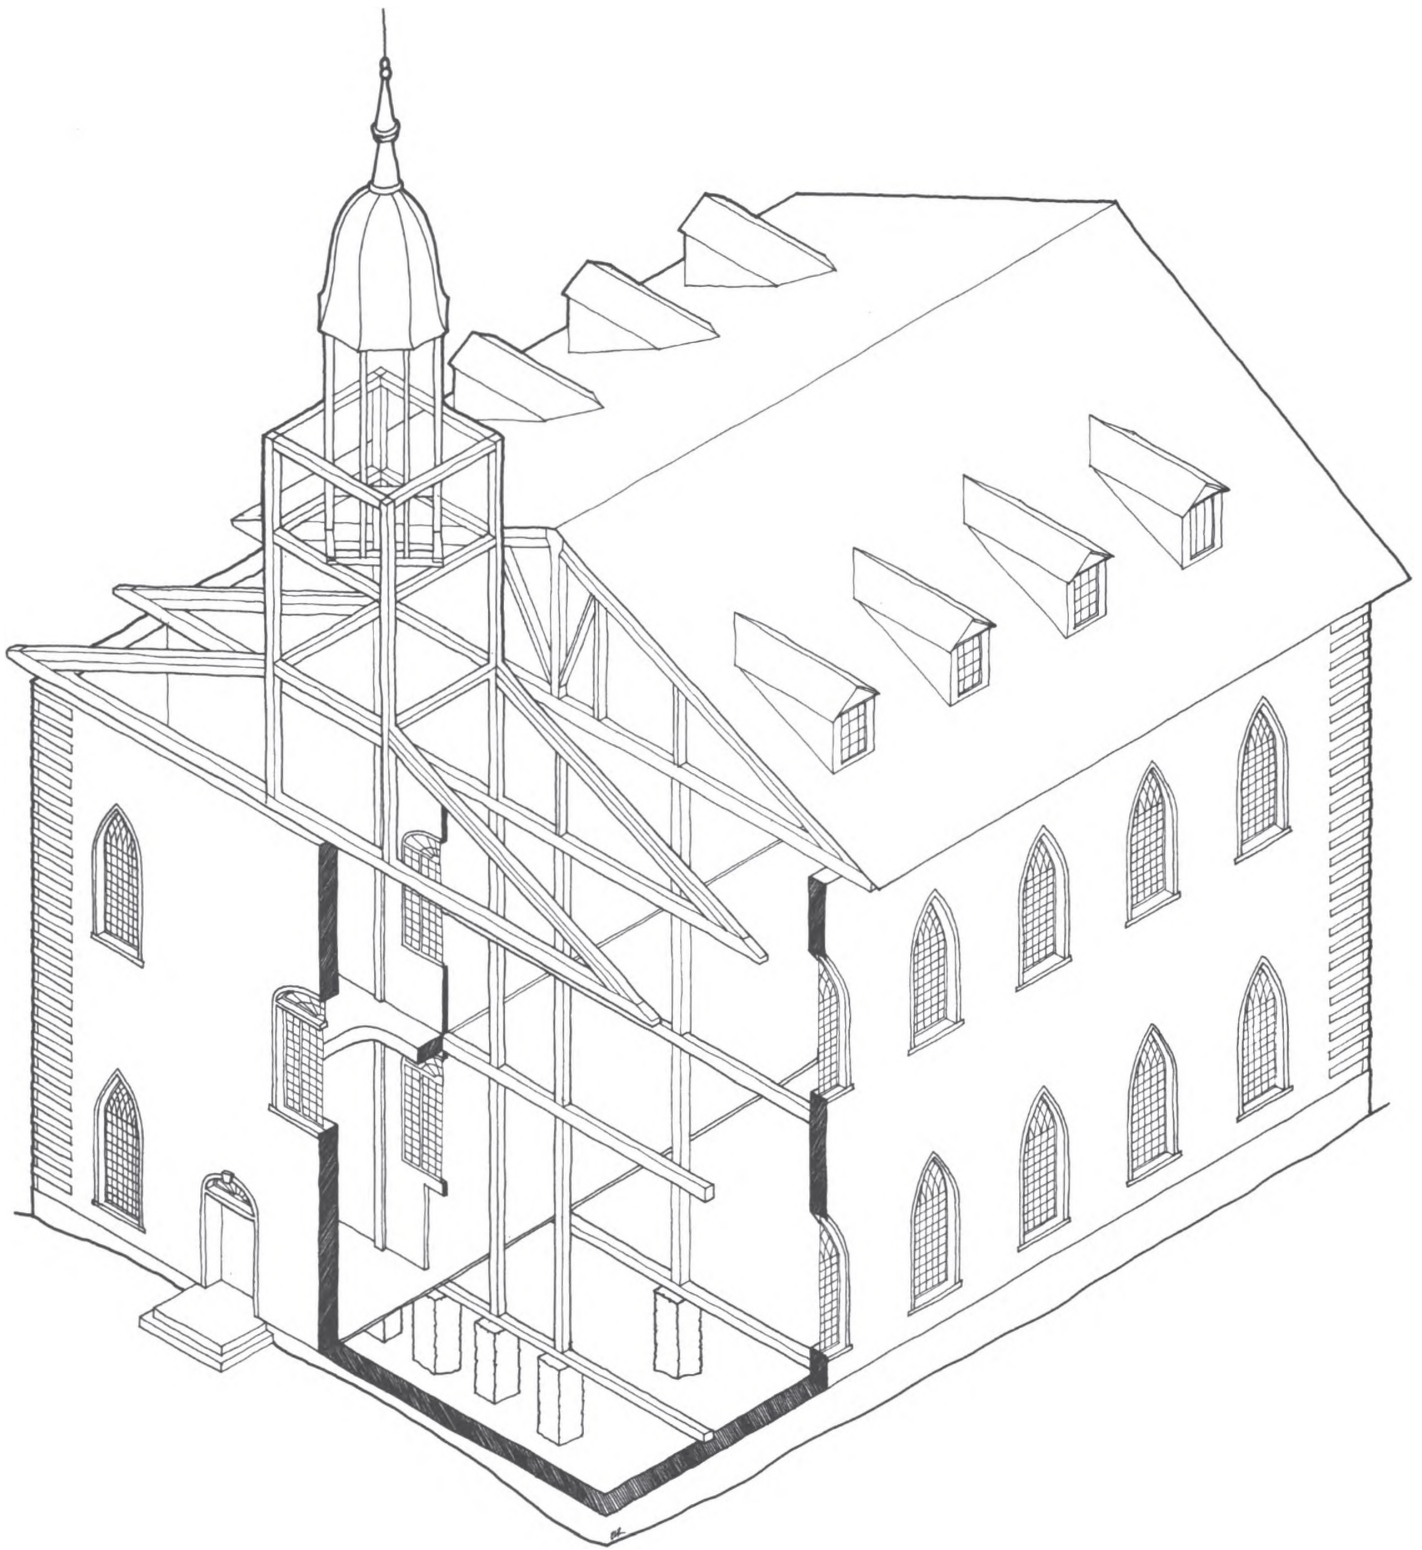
Cutaway axonometric showing the masonry piers, vestibule wall, and major framing timbers of the roof and tower.
